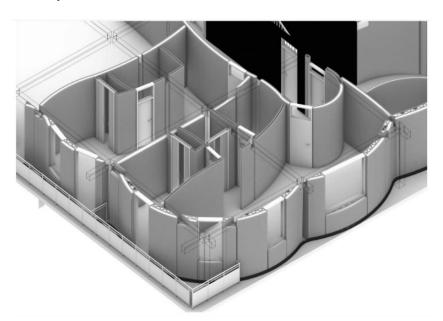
Example of a building model with indoor partitions and outdoor envelope with 3D-printed walls (Source: authors).
